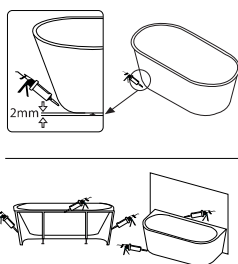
In the case of a wall-mounted bathtub, protect the contact area between the bathtub and the wall and the floor with silicone. Leave the silicone to dry according to the manufacturer's recommendations.
